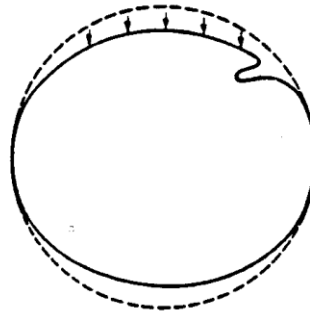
Localized Wall Buckling (Goddard 1994)
